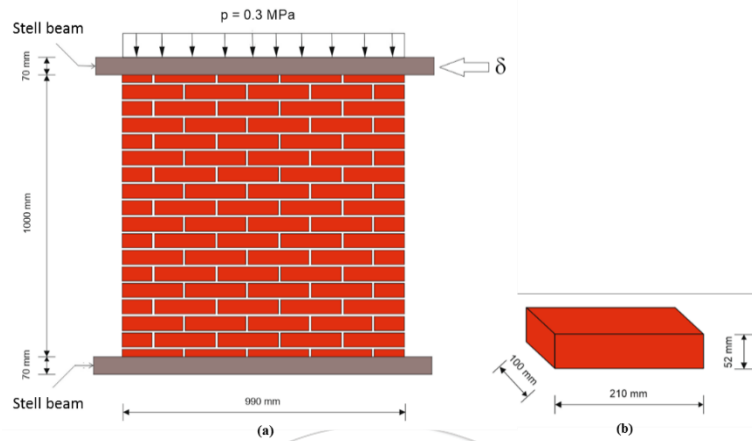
(a) Masonry wall geometry (b) masonry unit used in the wall
